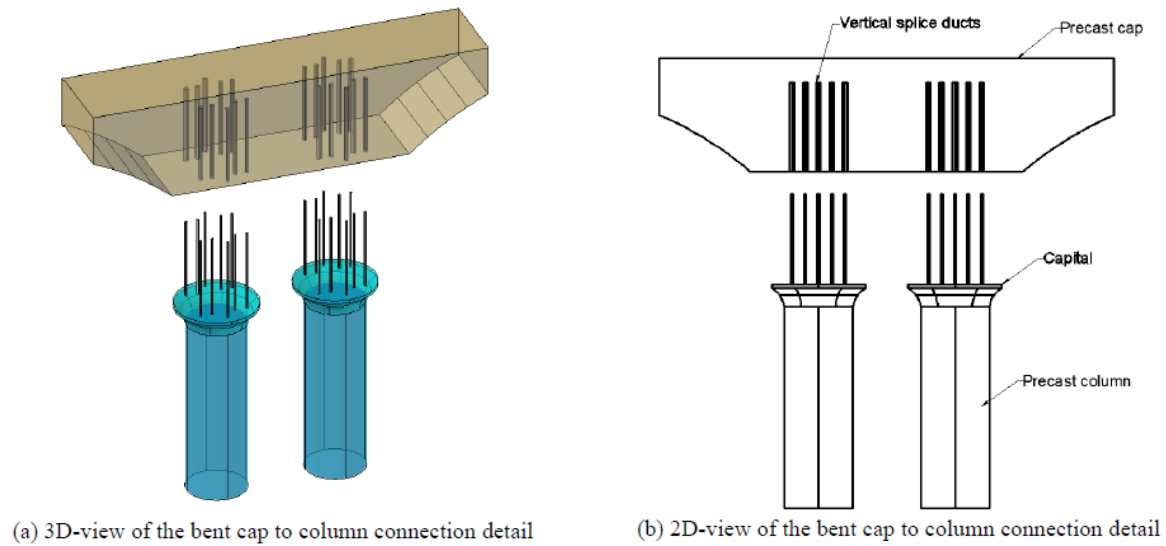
Vertical splice duct connection between precast column and precast bent cap (FHWA 2009)
